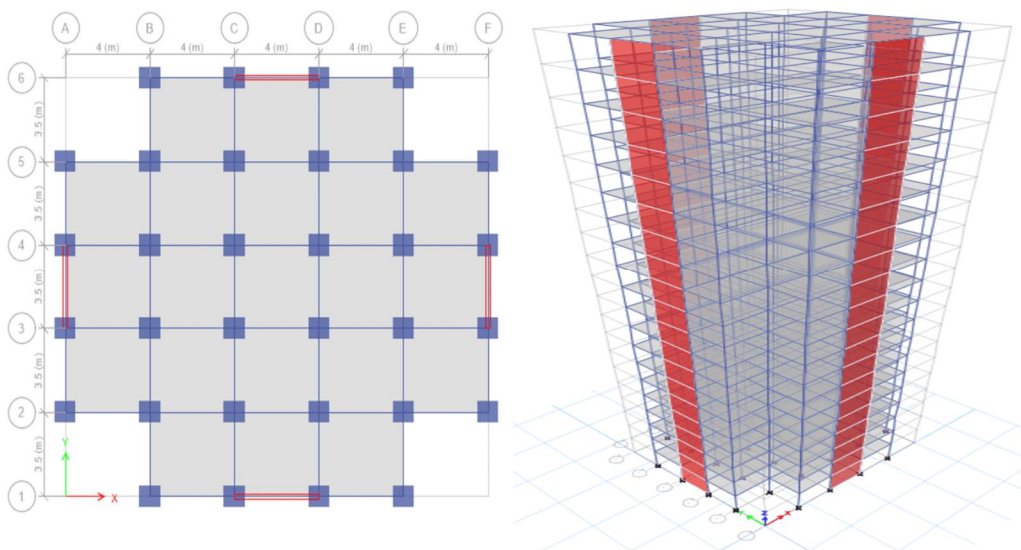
Plan and 3D view of Irregular building with shear walls at centre on each side
